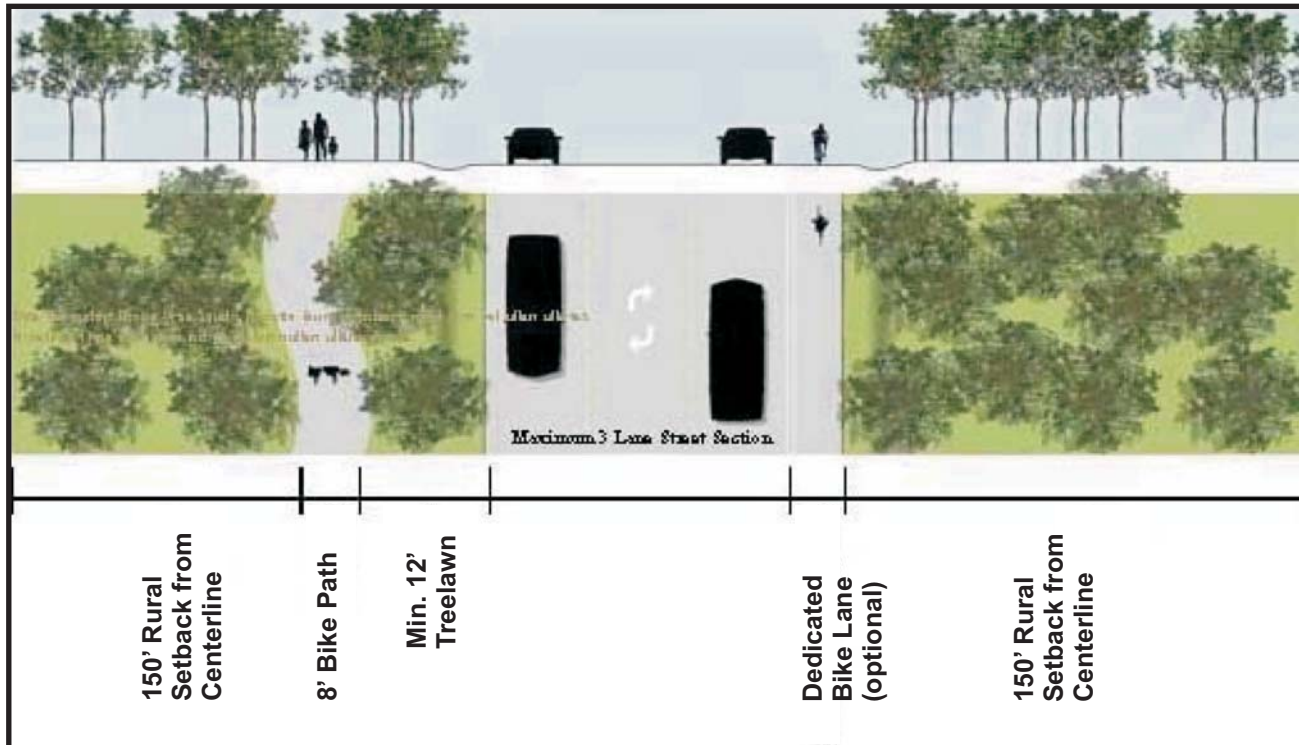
Rural Corridor Street Typology (Source: Etna Township 310 Corridor Plan: Draft, MSI Planning and Design).
